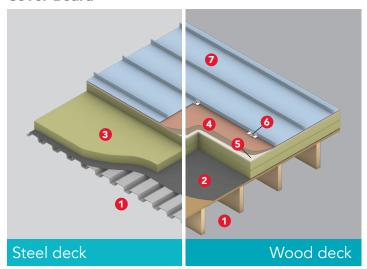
Architectural metal roof panel system anchored using a cover board resting directly on the insulation, over steel or wood decking
